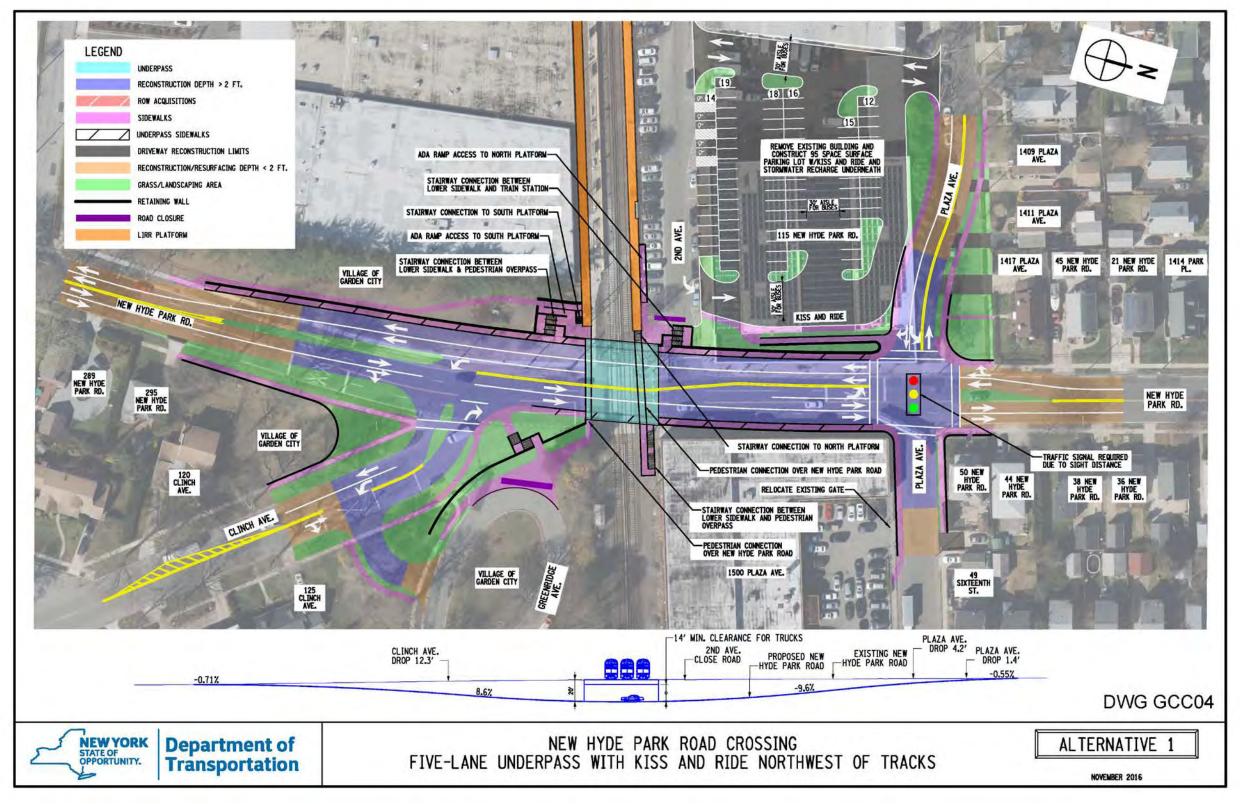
New Hyde Park Road Crossing (Alternative 1: Five-Lane Underpass with Kiss and Ride Northwest of Tracks)
